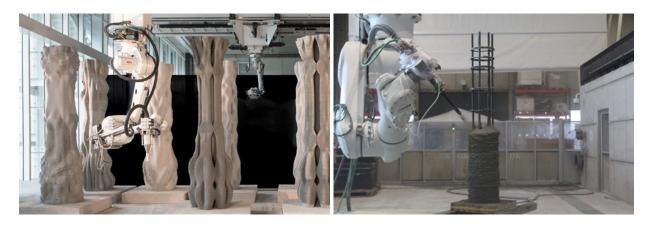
;7; (left) extrusion deposition printing of complex structural members using an inverted robotic gantry system [7] and (right) shotcrete spray deposition printing of a reinforced steel column [8].
